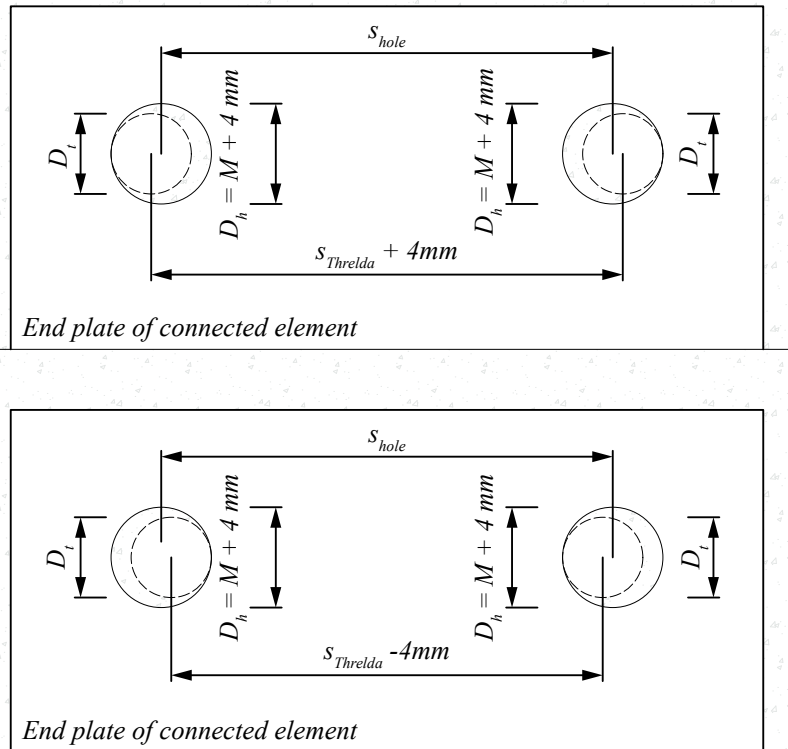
Tolerances for holes for bolts on connected end plate.
